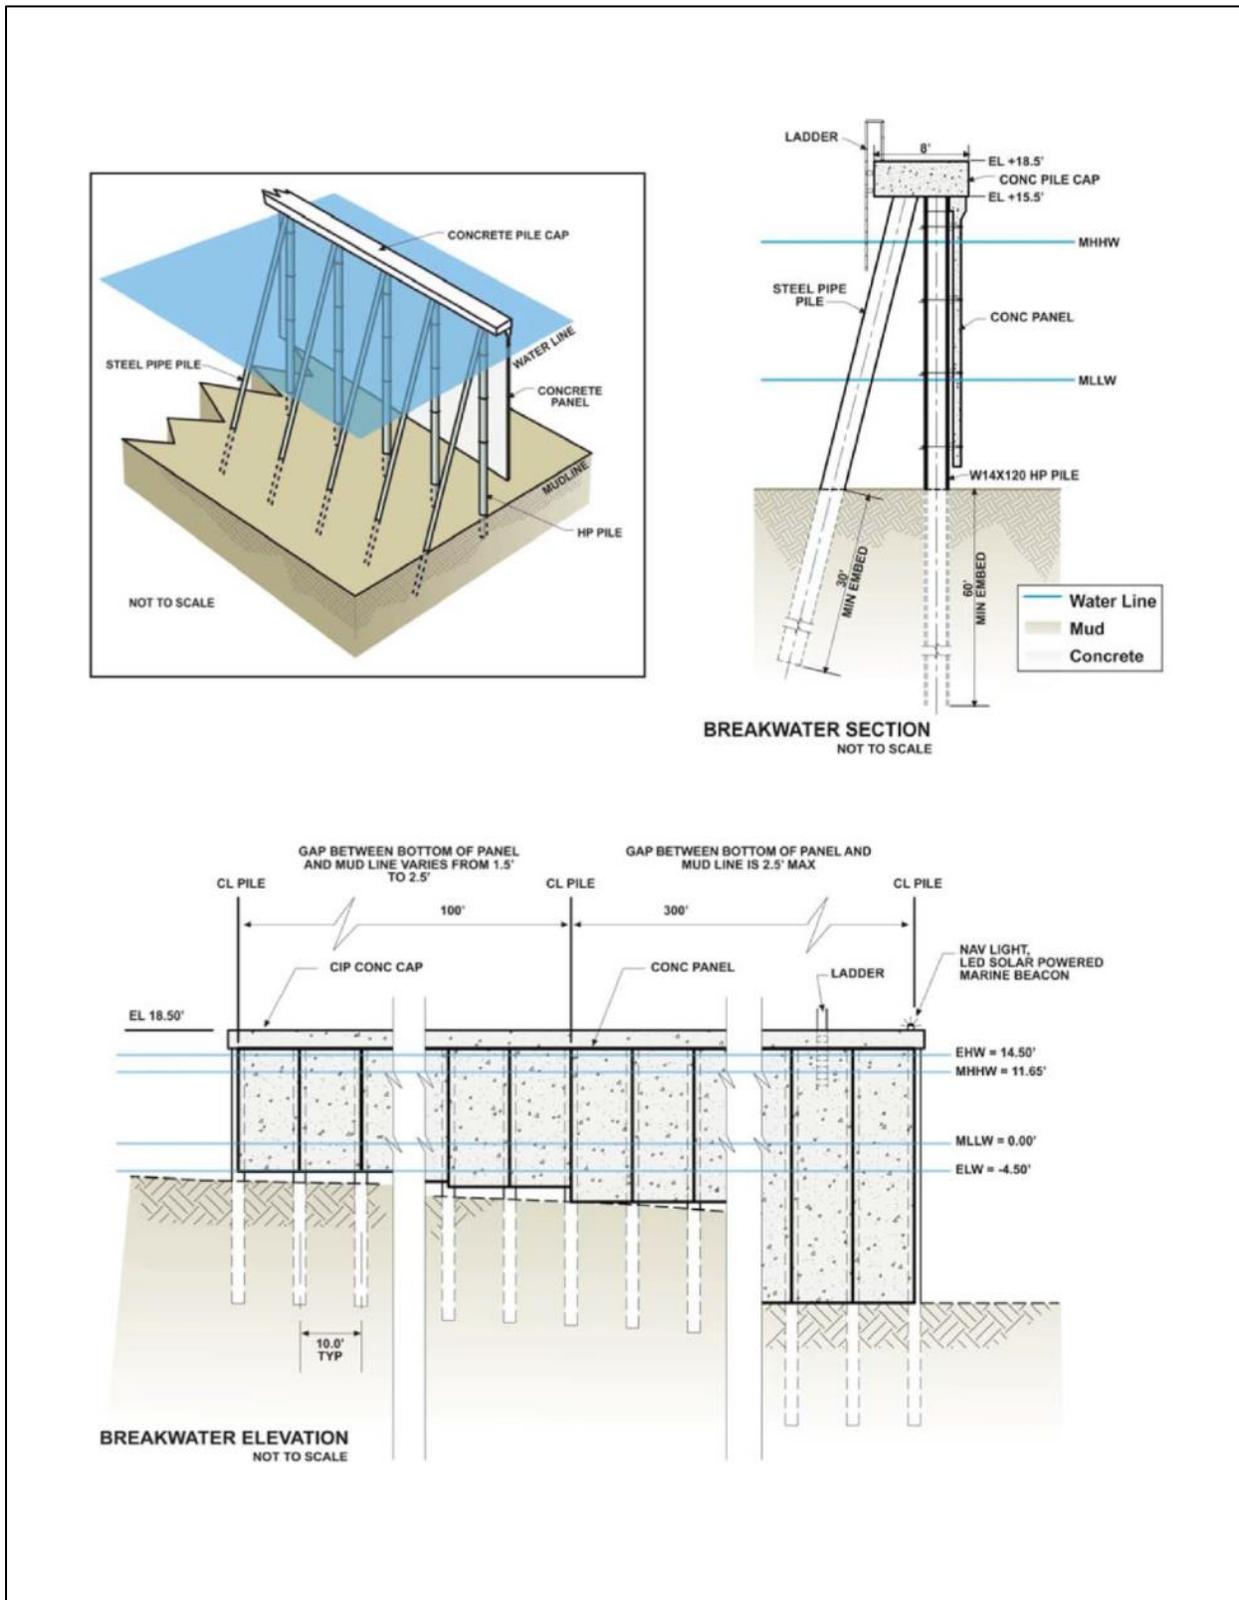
Alternative 3 – Breakwater Sections and Elevations
